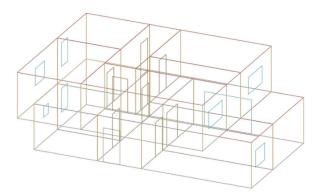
Simulated two-storey building model comprising of wall, door and window surfaces.
